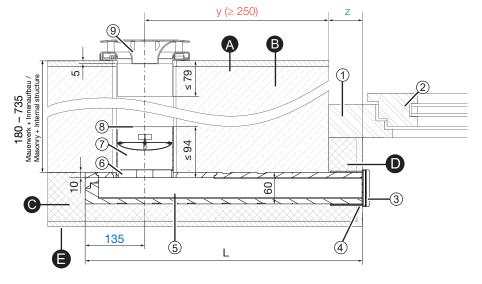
Sectional drawing aV100 wall installation set Corner version with Avio N 100
